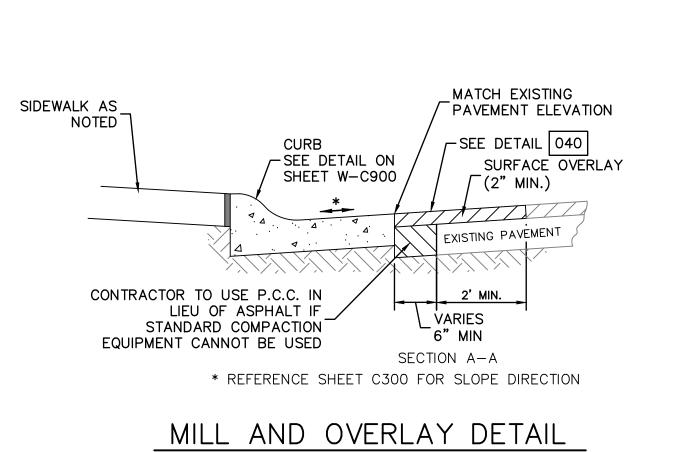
DETAILS - SEE DETAIL SHEET W-C900 AND W-C905 FOR THE FOLLOWING DETAILS
